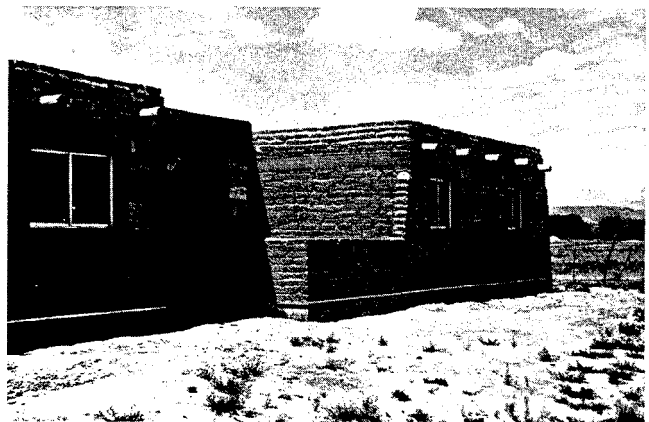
H U D STABILIZED-ADOBE HOUSE UNDER CONSTRUCTION. SAN ILDEFONSO.
